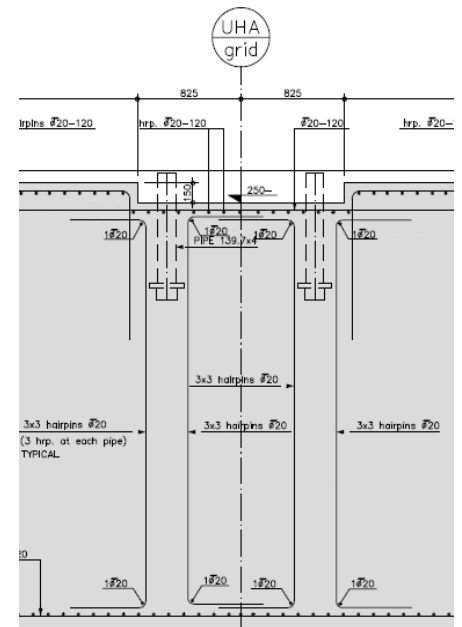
Fig. I Cut-out from a technical drawing. Arrangement of reinforcement to forward the loads to the bottom of the foundation
